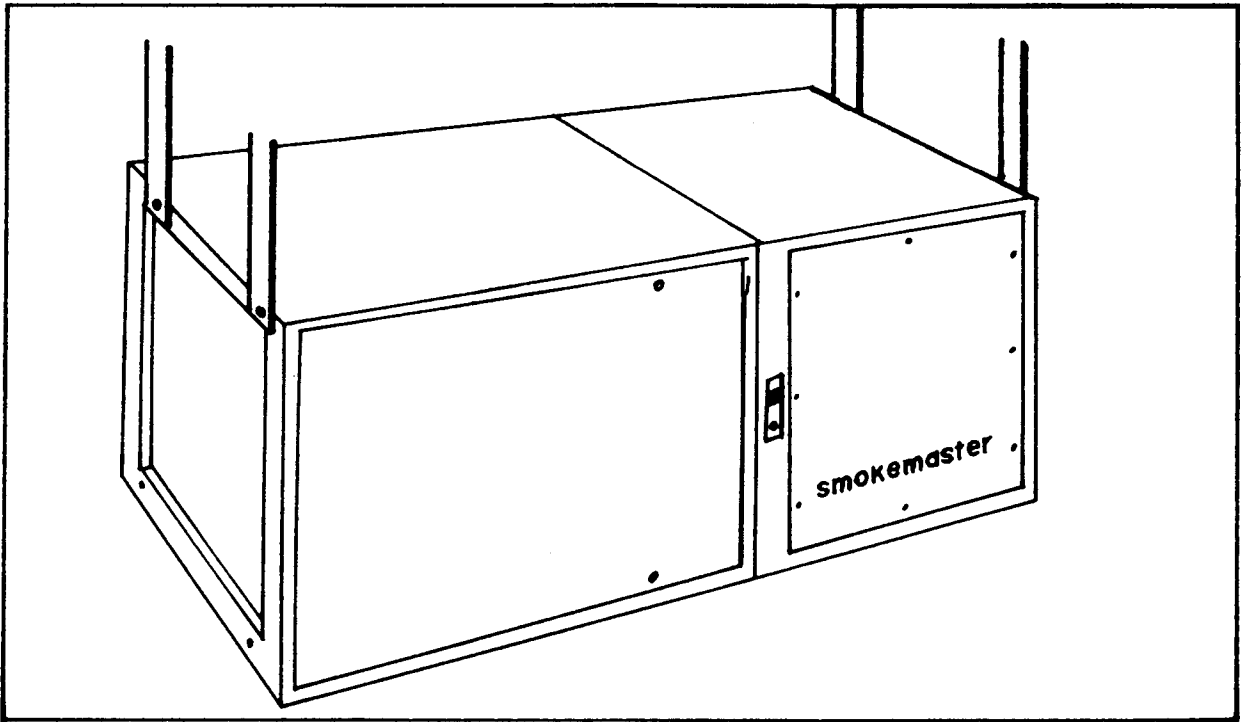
MOUNTING THE M66 OVERHEAD.
